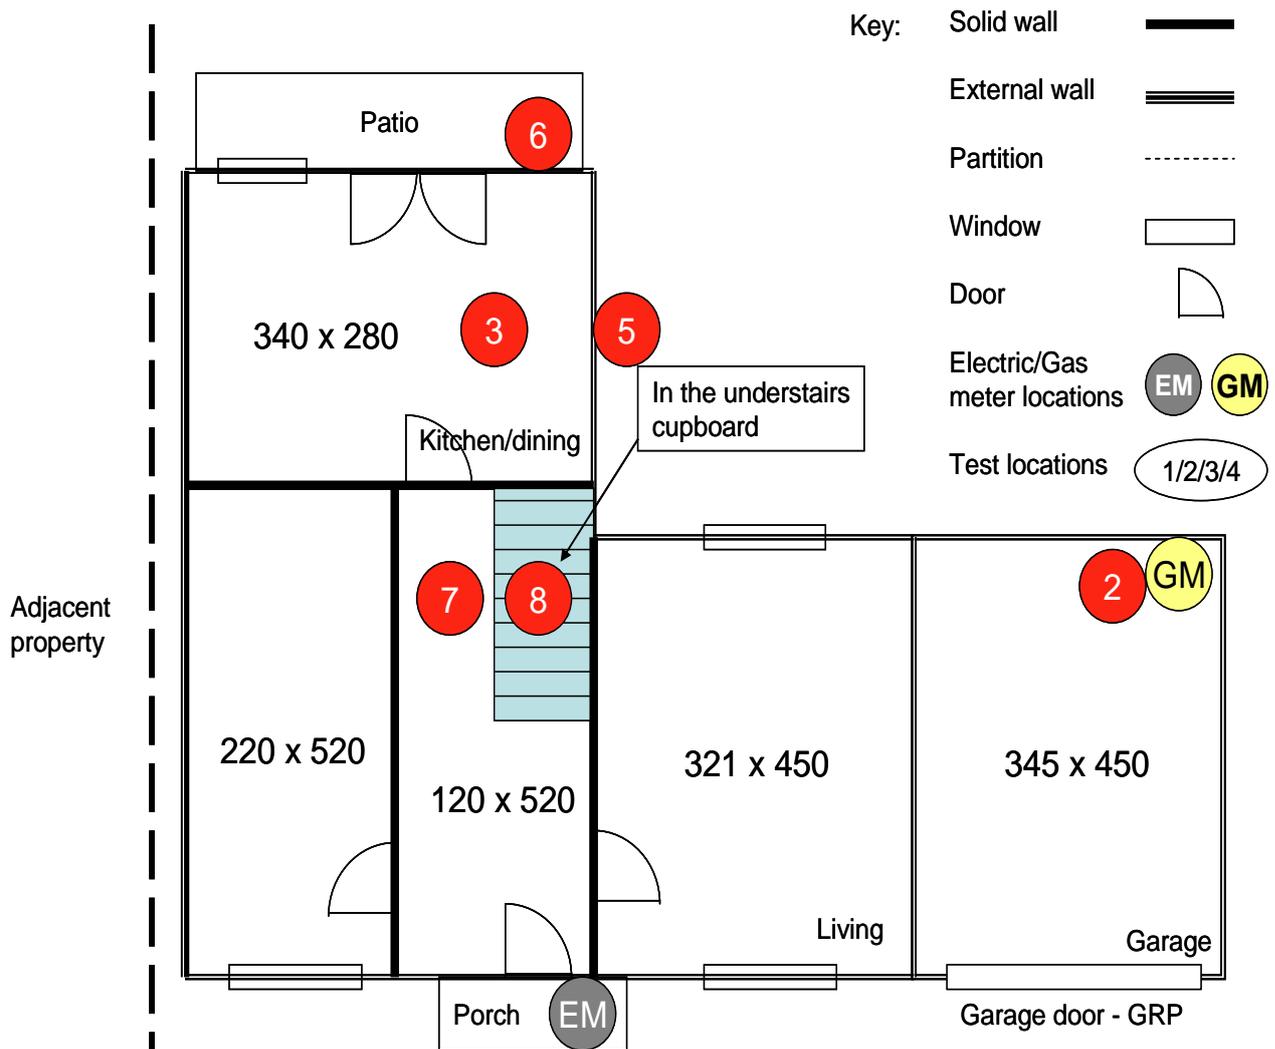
Example floor plan showing dimensions of room (in cm), test locations, window/door locations and wall types
